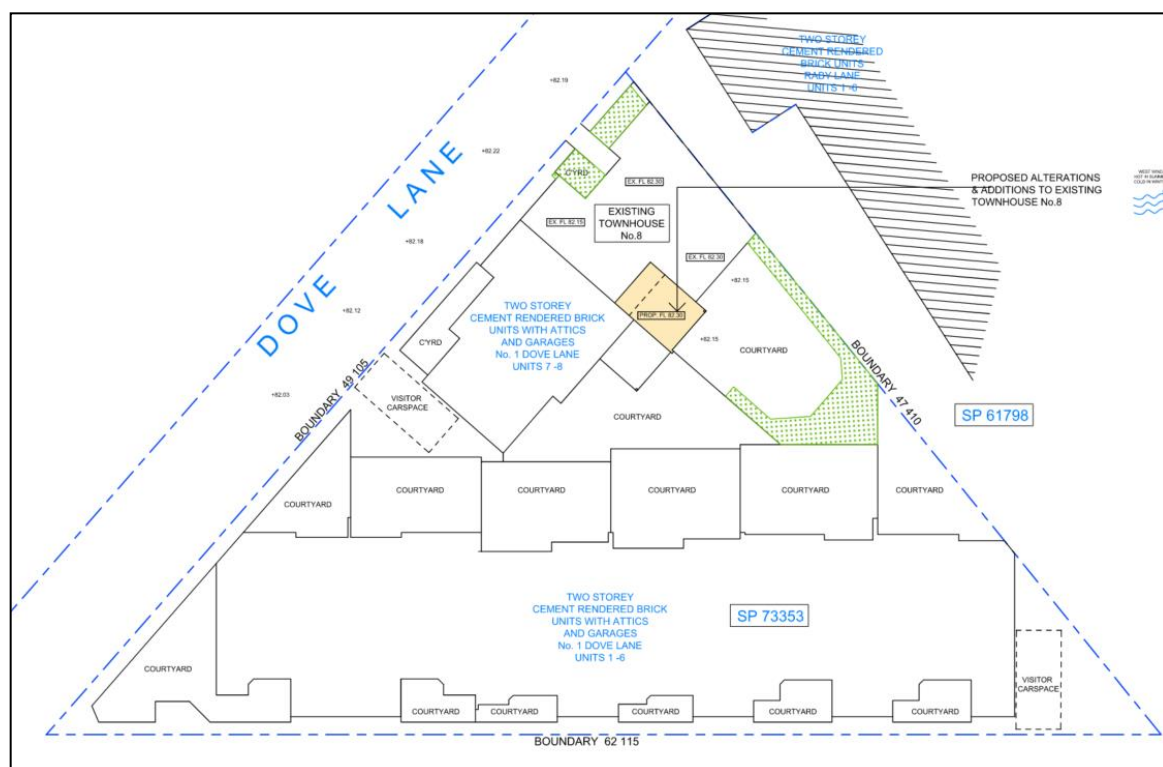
Proposed site plan – 8/1 Dove Lane, Randwick
